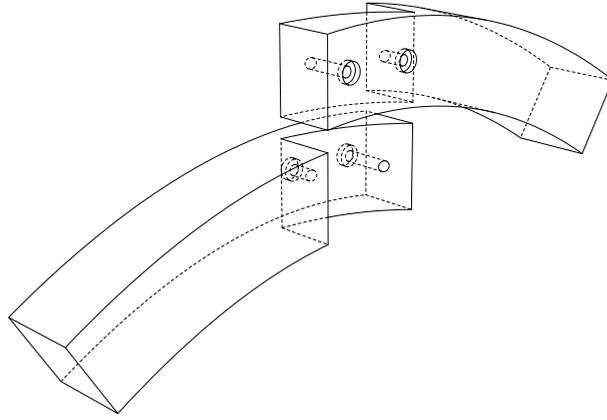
A sideways parametric splice joint - EndLapJoint.
